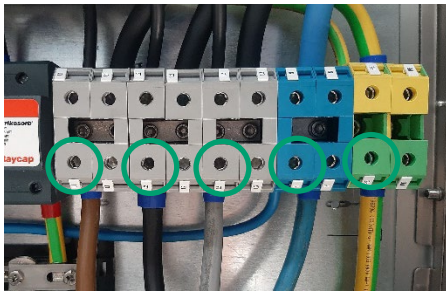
AC TERMINAL STRIP CONNECTIONS
